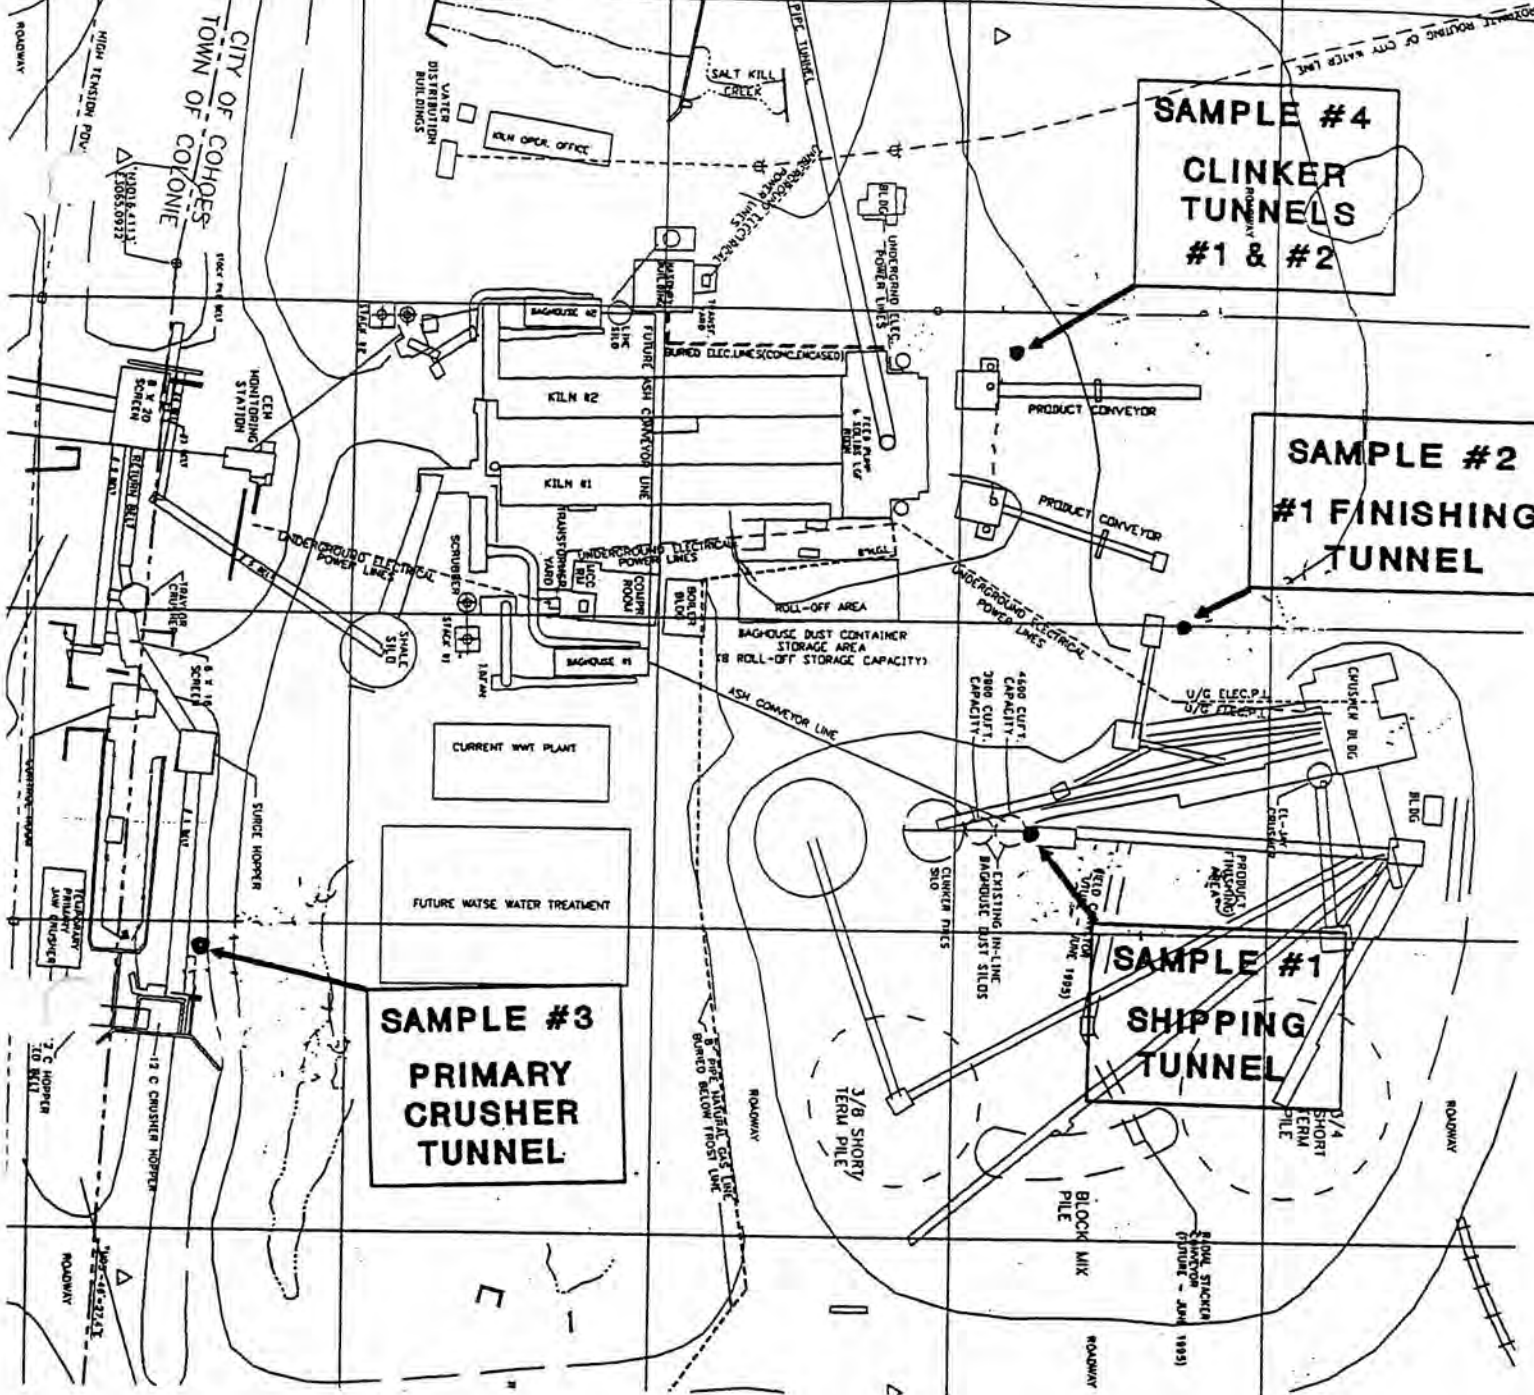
NORLITE BMP PLAN APPENDIX E
